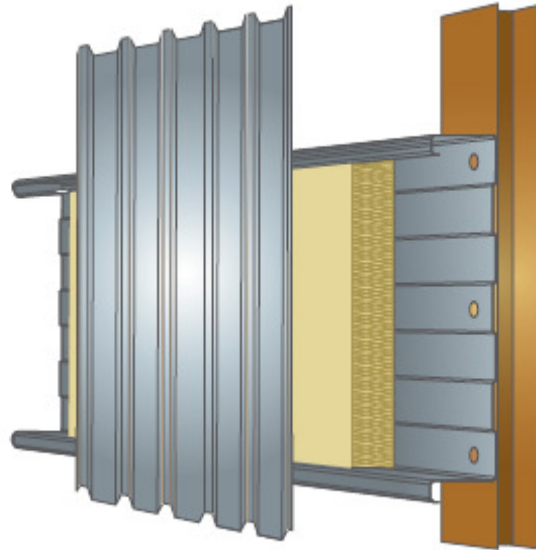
Typically two layer build-up wall cladding system with liner trays
